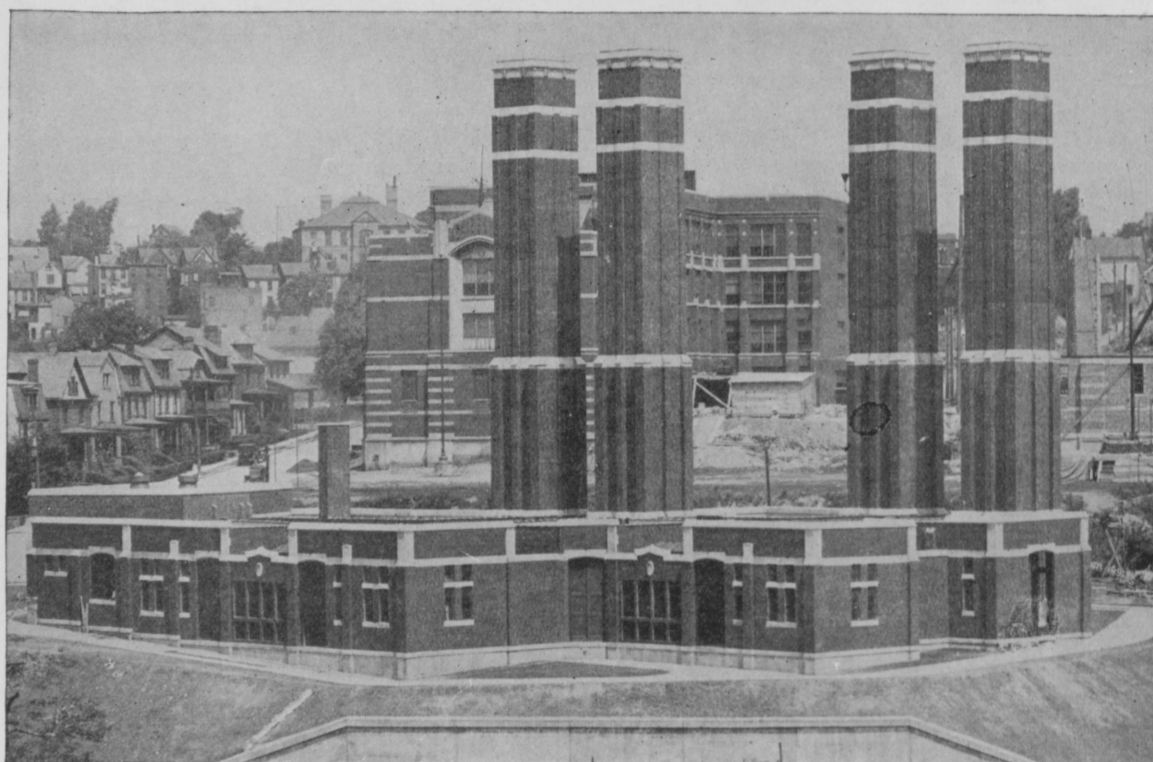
VIEW OF POWER HOUSE SHOWING THE VENTILATING STACKS OVER THE TWO TUBES
